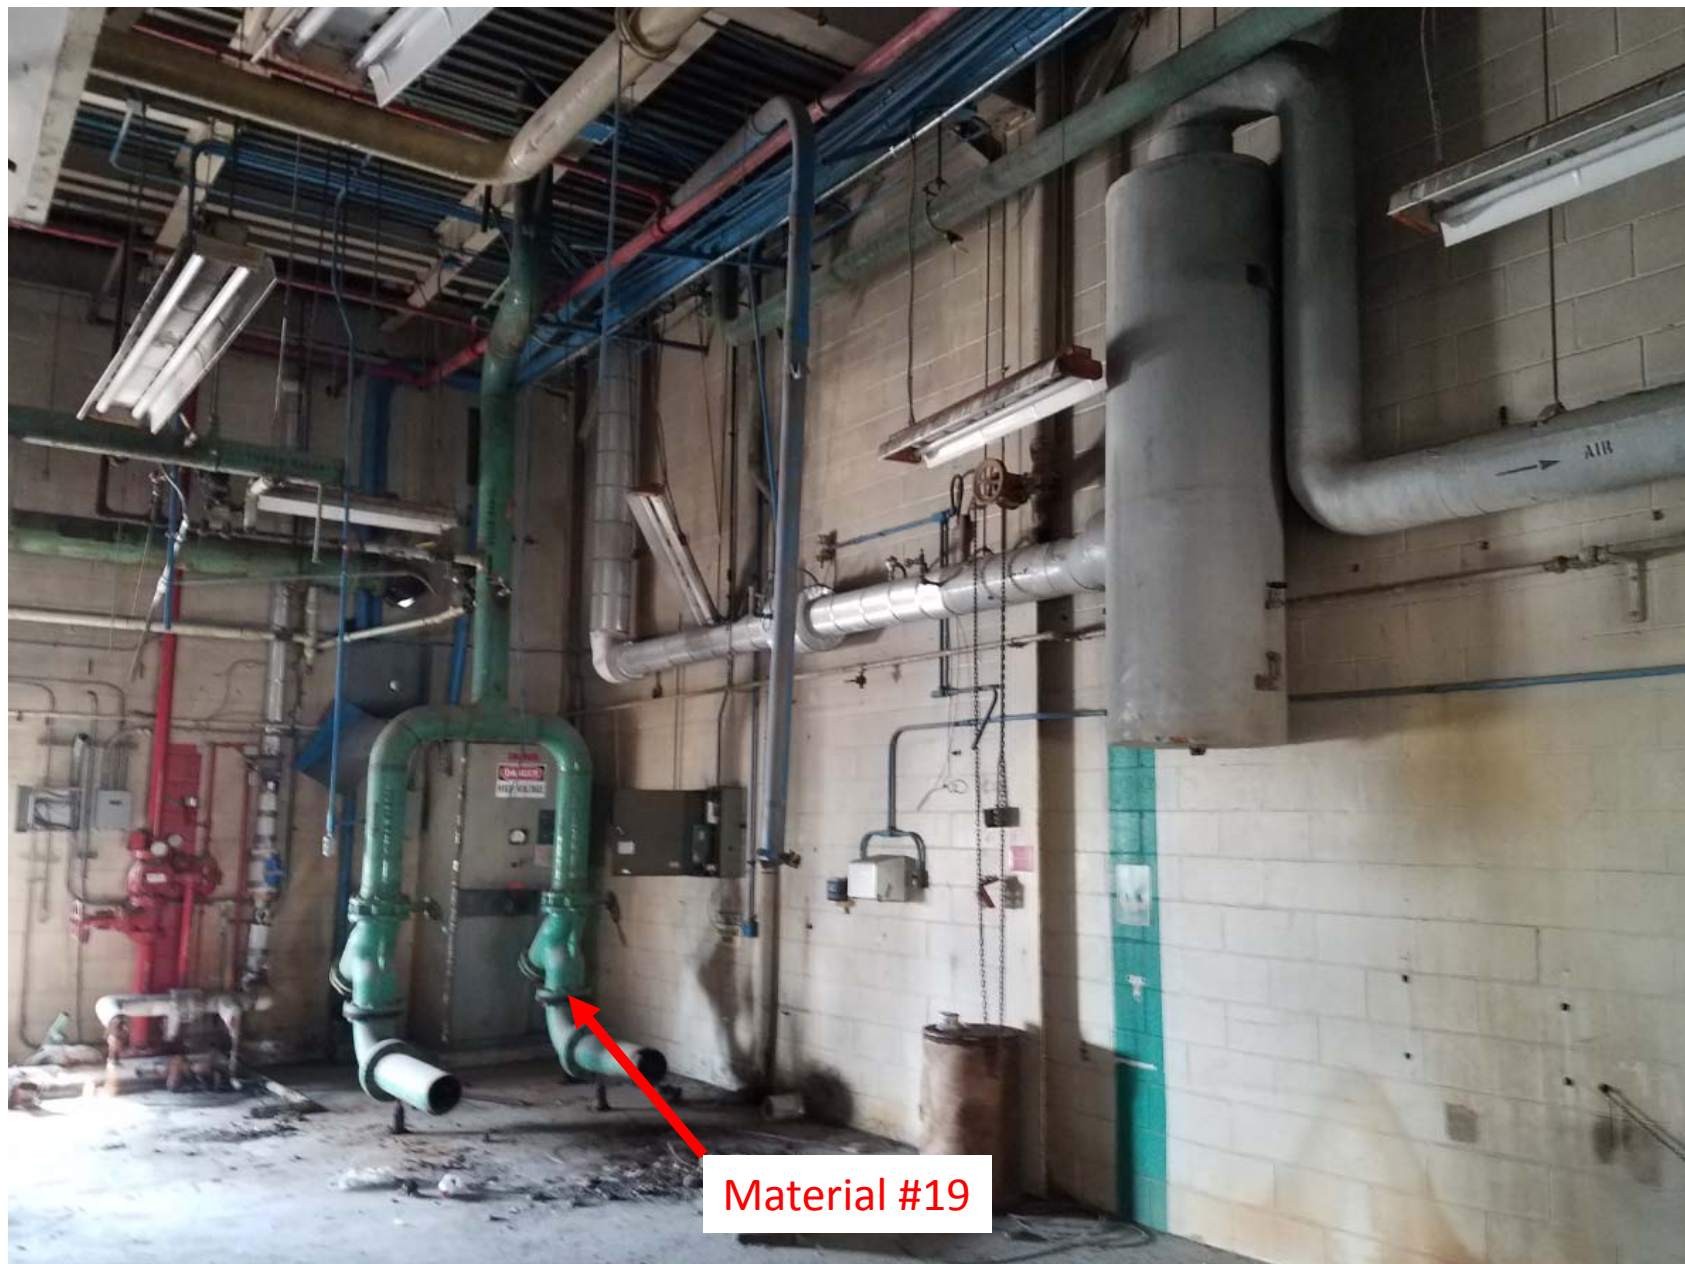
Northwest Building interior. Gaskets (Material #19) on all piping are ACM.
